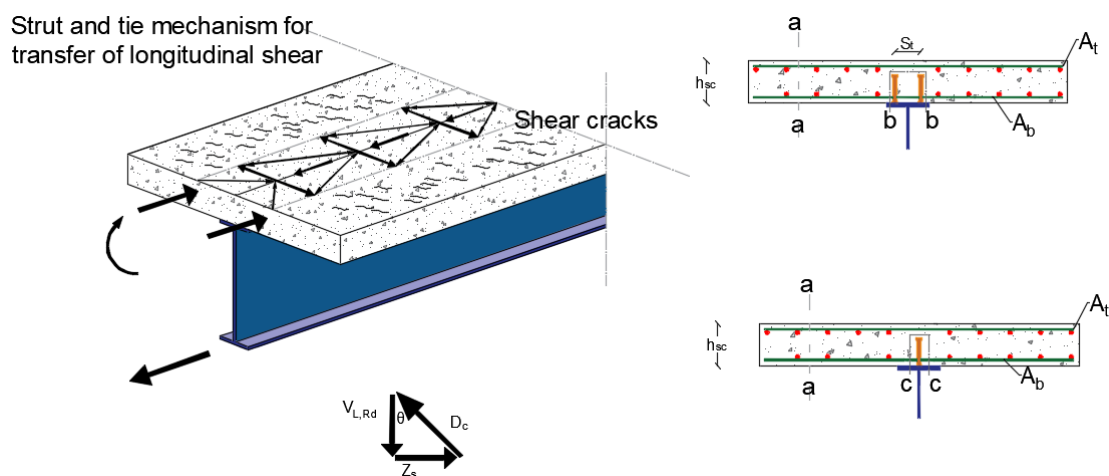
Failure mechanism and typical sections for checking shear failure, redrawn from (Vayas & Iliopoulos, 2014)
